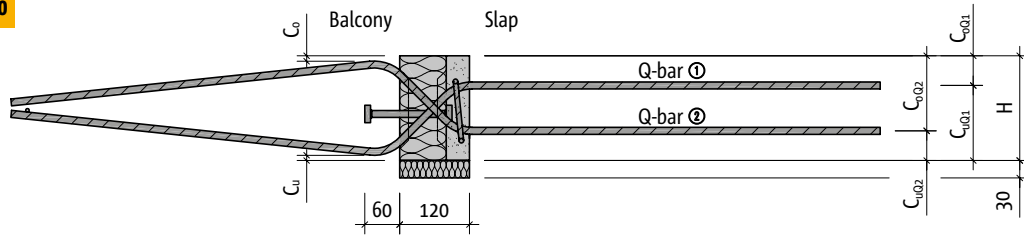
Section: Schöck Isokorb® type RQP60+RQP60
